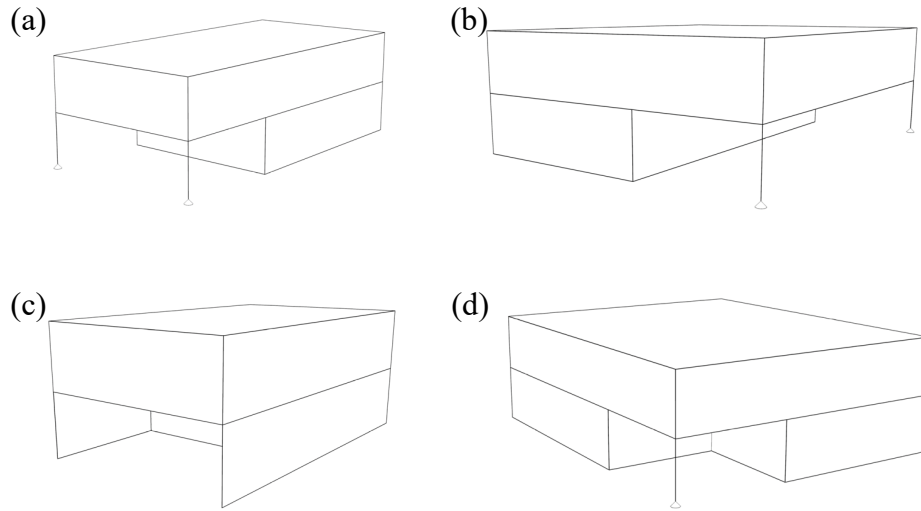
Schematic isometric views of typical SWOF woodframe building configurations identified from survey: (a) L1, (b) L2, (c) L3 and (d) L4
